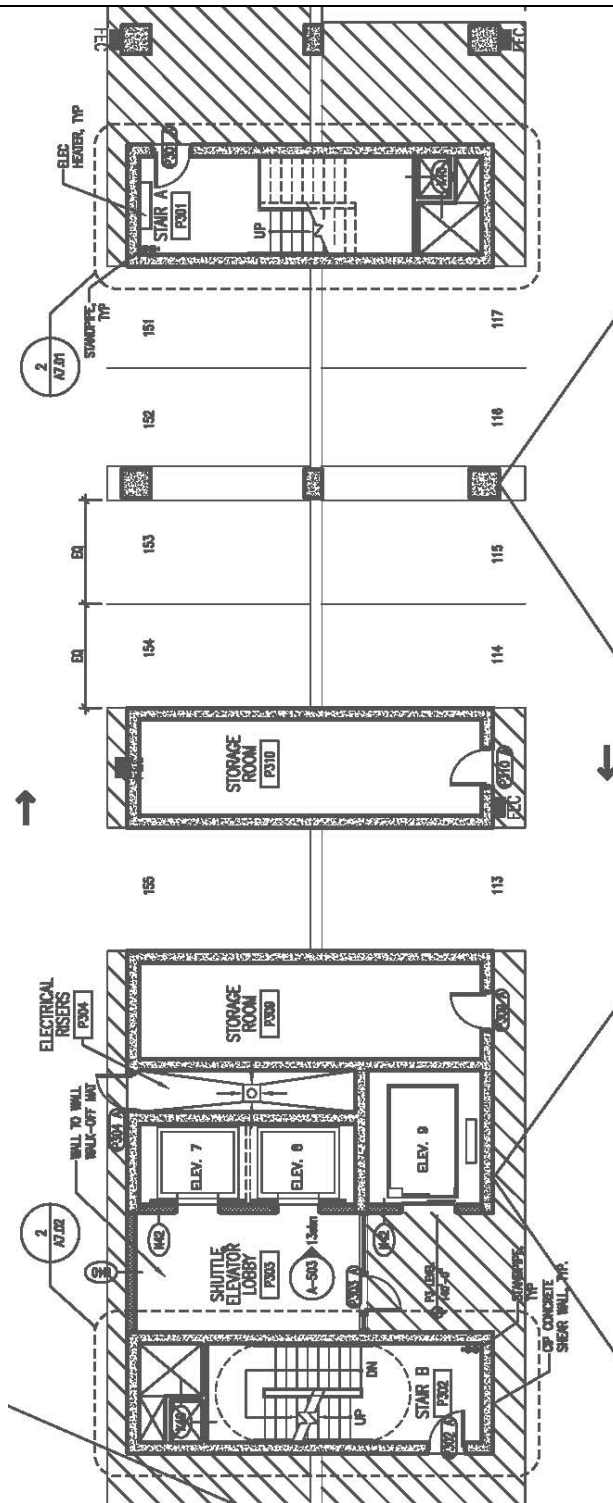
Original Parking Garage P3 Level Service Core Plan
